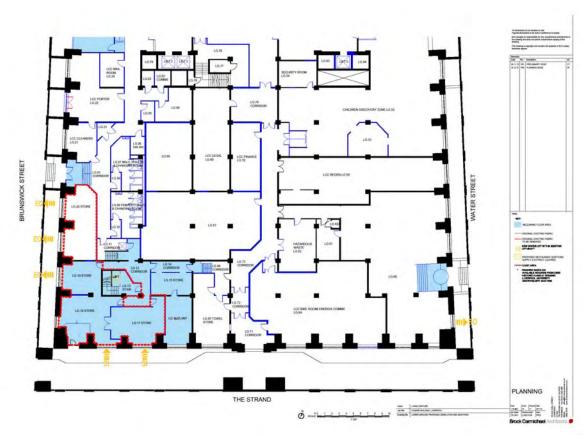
Lower Ground Floor Proposed Demolitions & Additions
